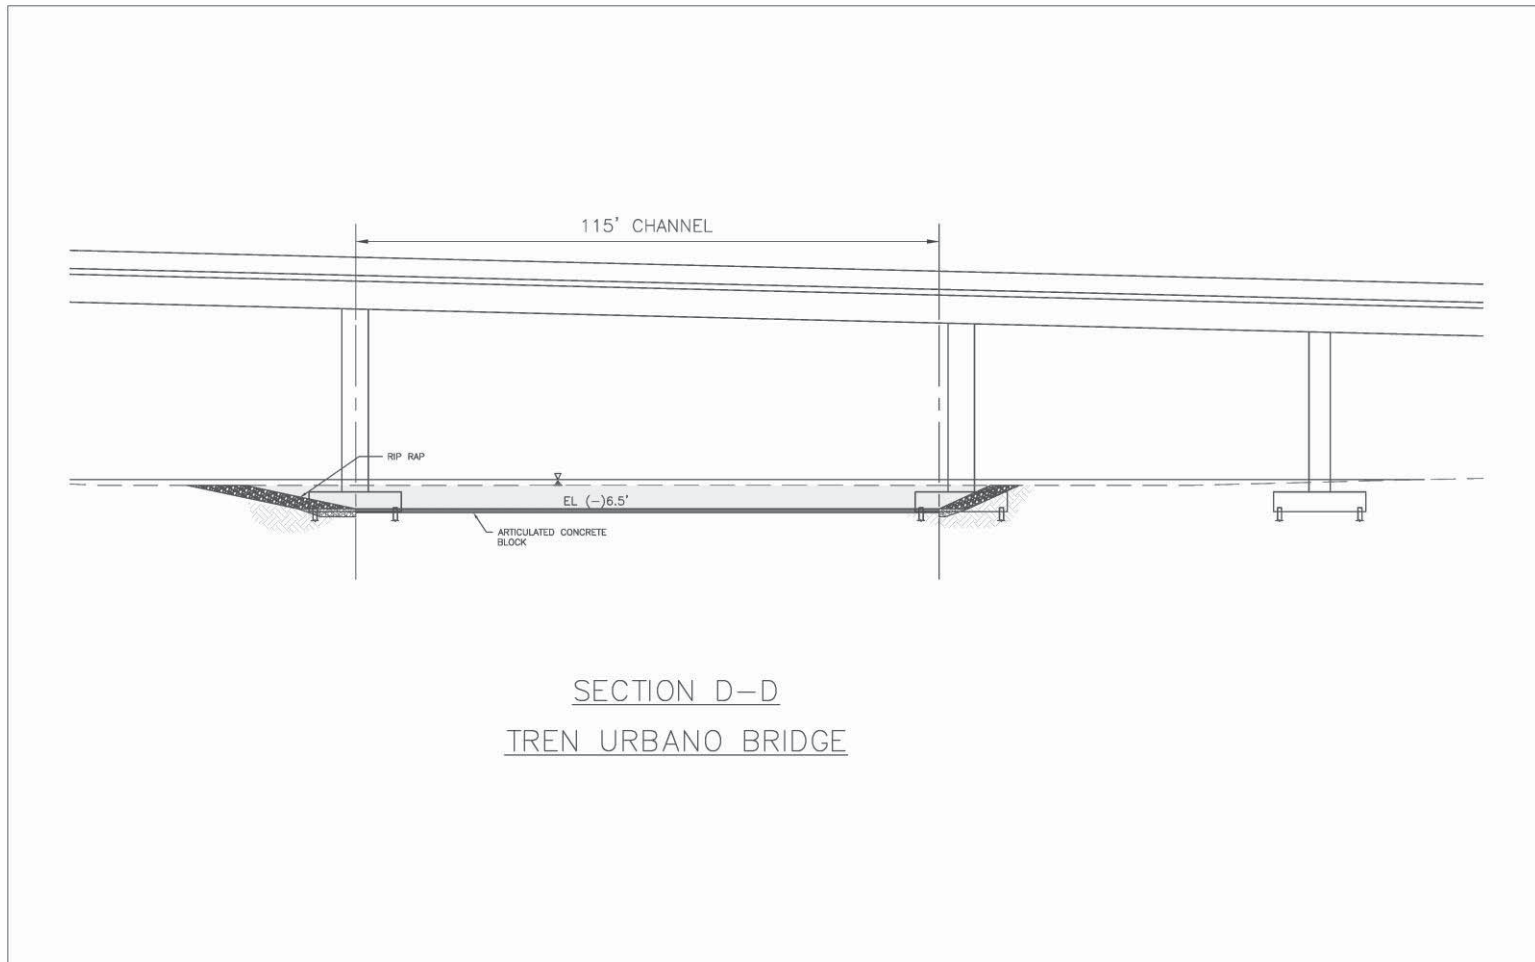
Cross Section D-D, Tren Urbano Bridge
